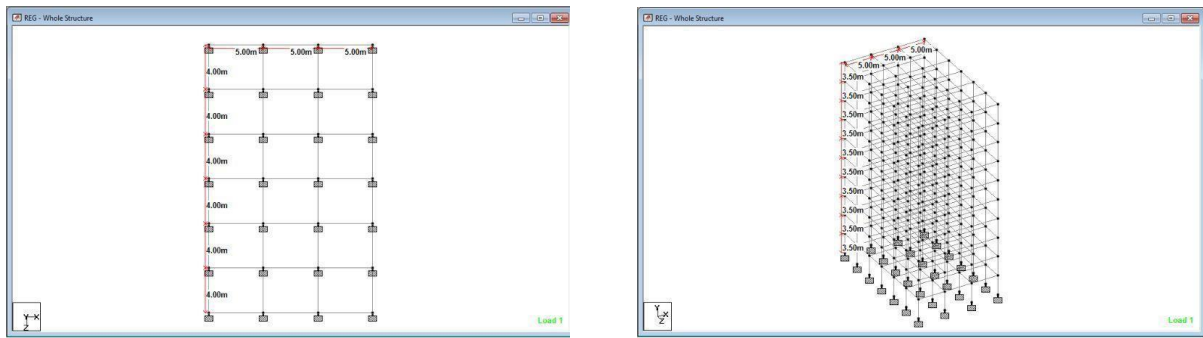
plan & 3D view of regular structure (10 storeys)
